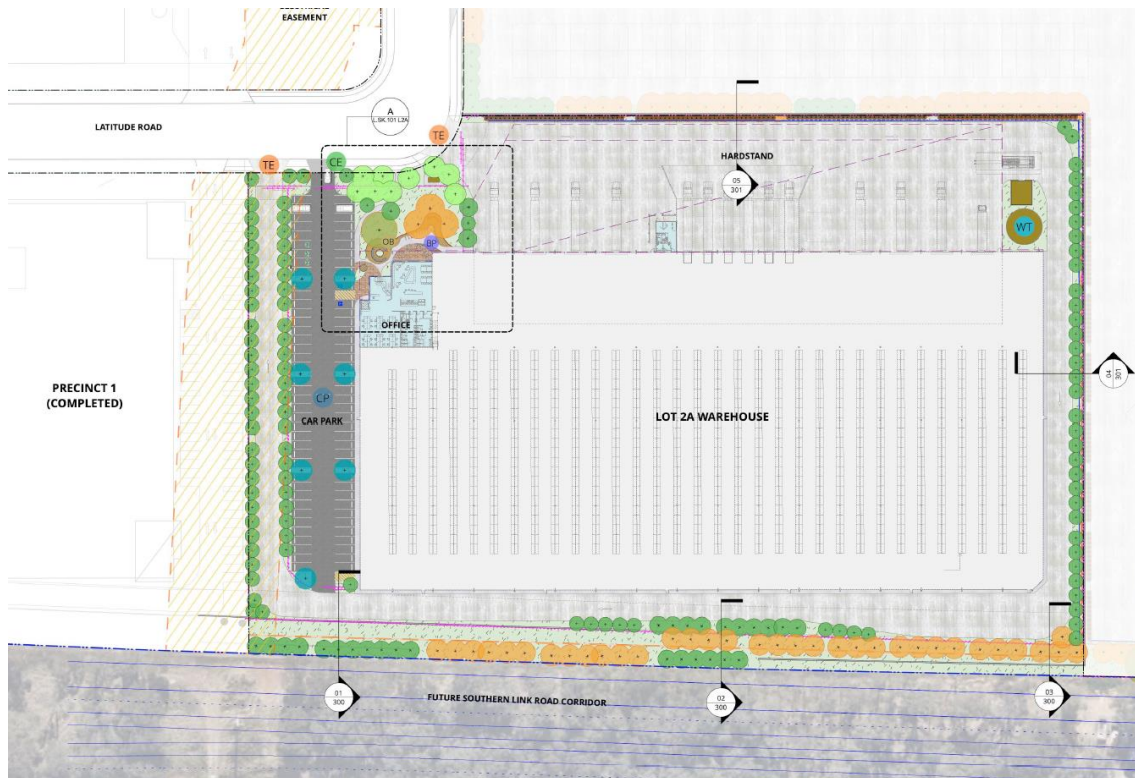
Landscape concept plan - Lot 2A (Source: Scape)
